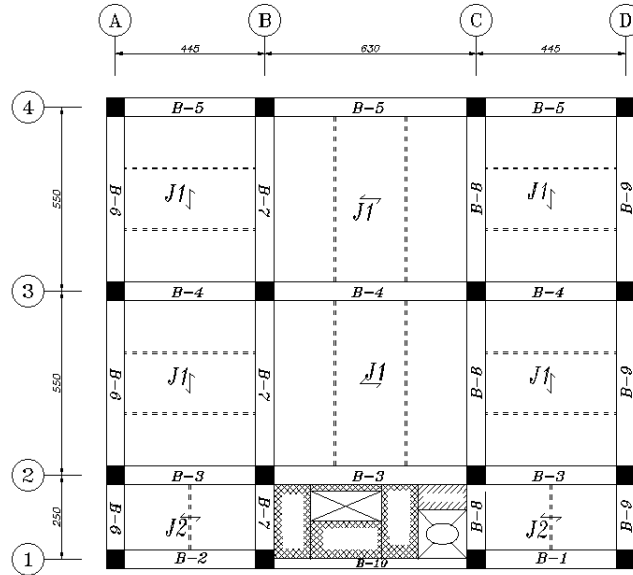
The plan to specify beam and floor types for elevation 0.00
